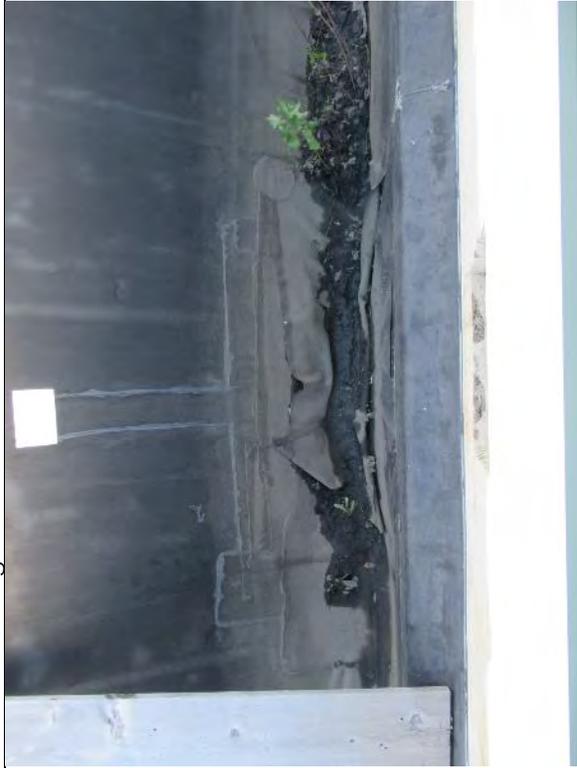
Edina Cleaners fully adhered EPDM roofing system damage at roof drain
